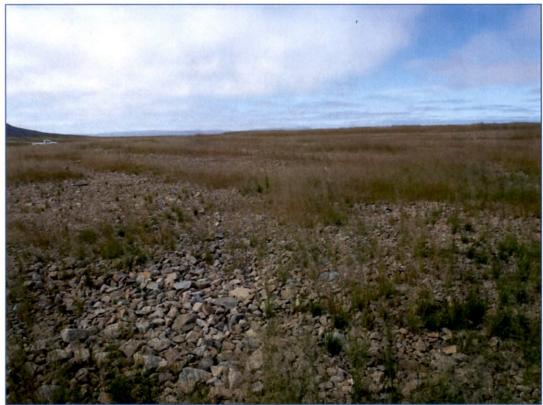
Site 7 Landfill - View of top of landfill from northeast corner, facing southwest.
